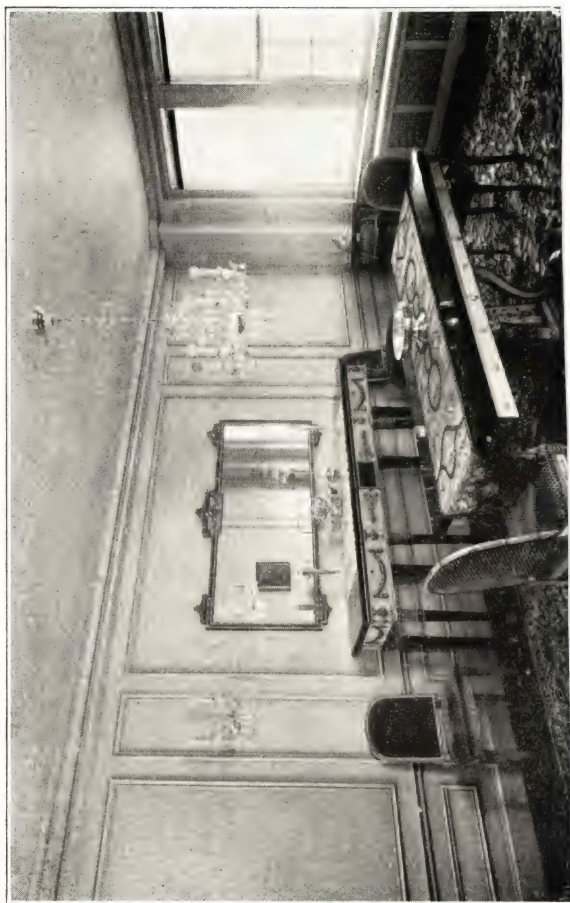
A.—Panel Layout Having the Charm of Simplicity—Constructed with Special Wood Mouldings and Wood Cornice.
